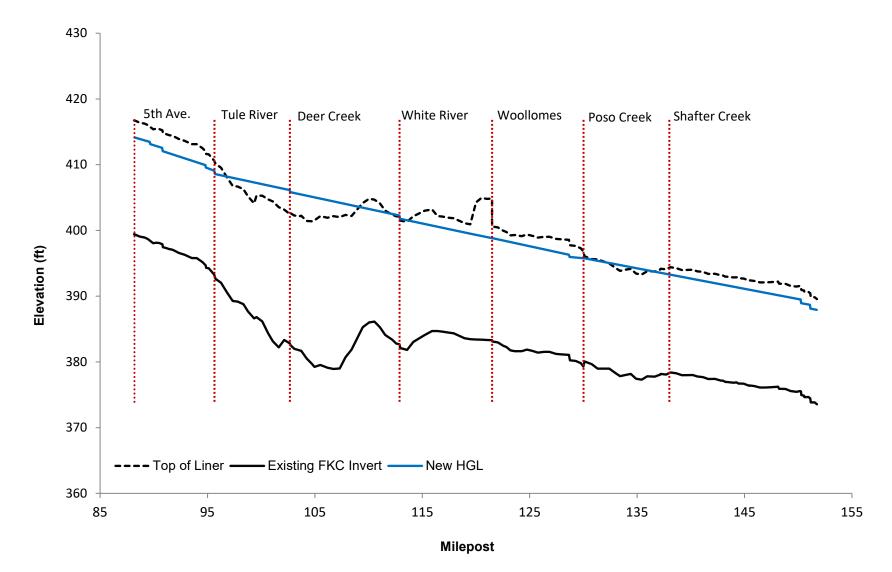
Canal Profile with Proposed Hydraulic Grade Line
